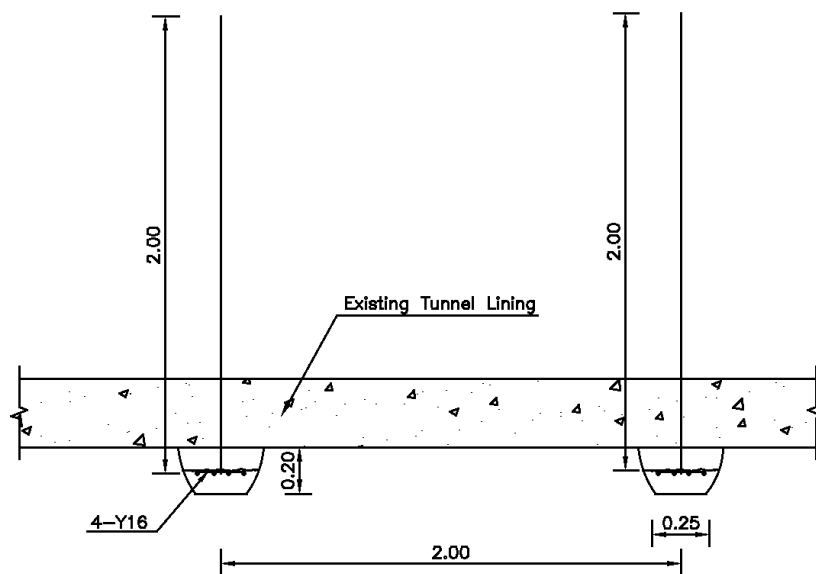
Typical Detail of Shotcrete Rib at the crown
